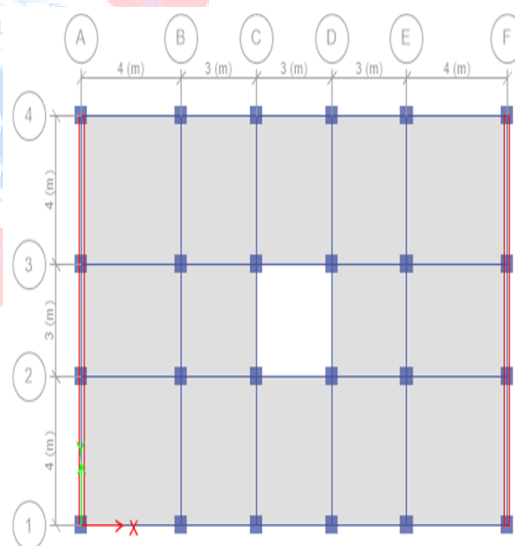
Plan view of the Structure with Shear Wall at Y-Direction
